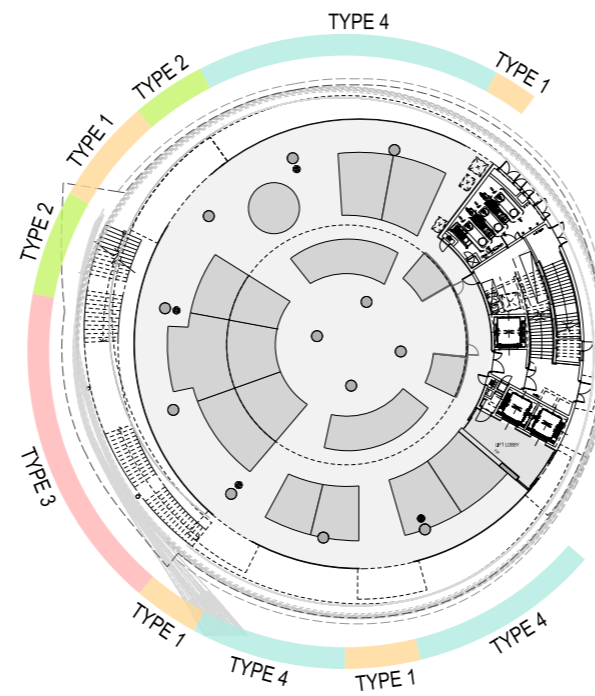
Proposed Ground Floor Plan - Indicative Market Hall Fit Out
